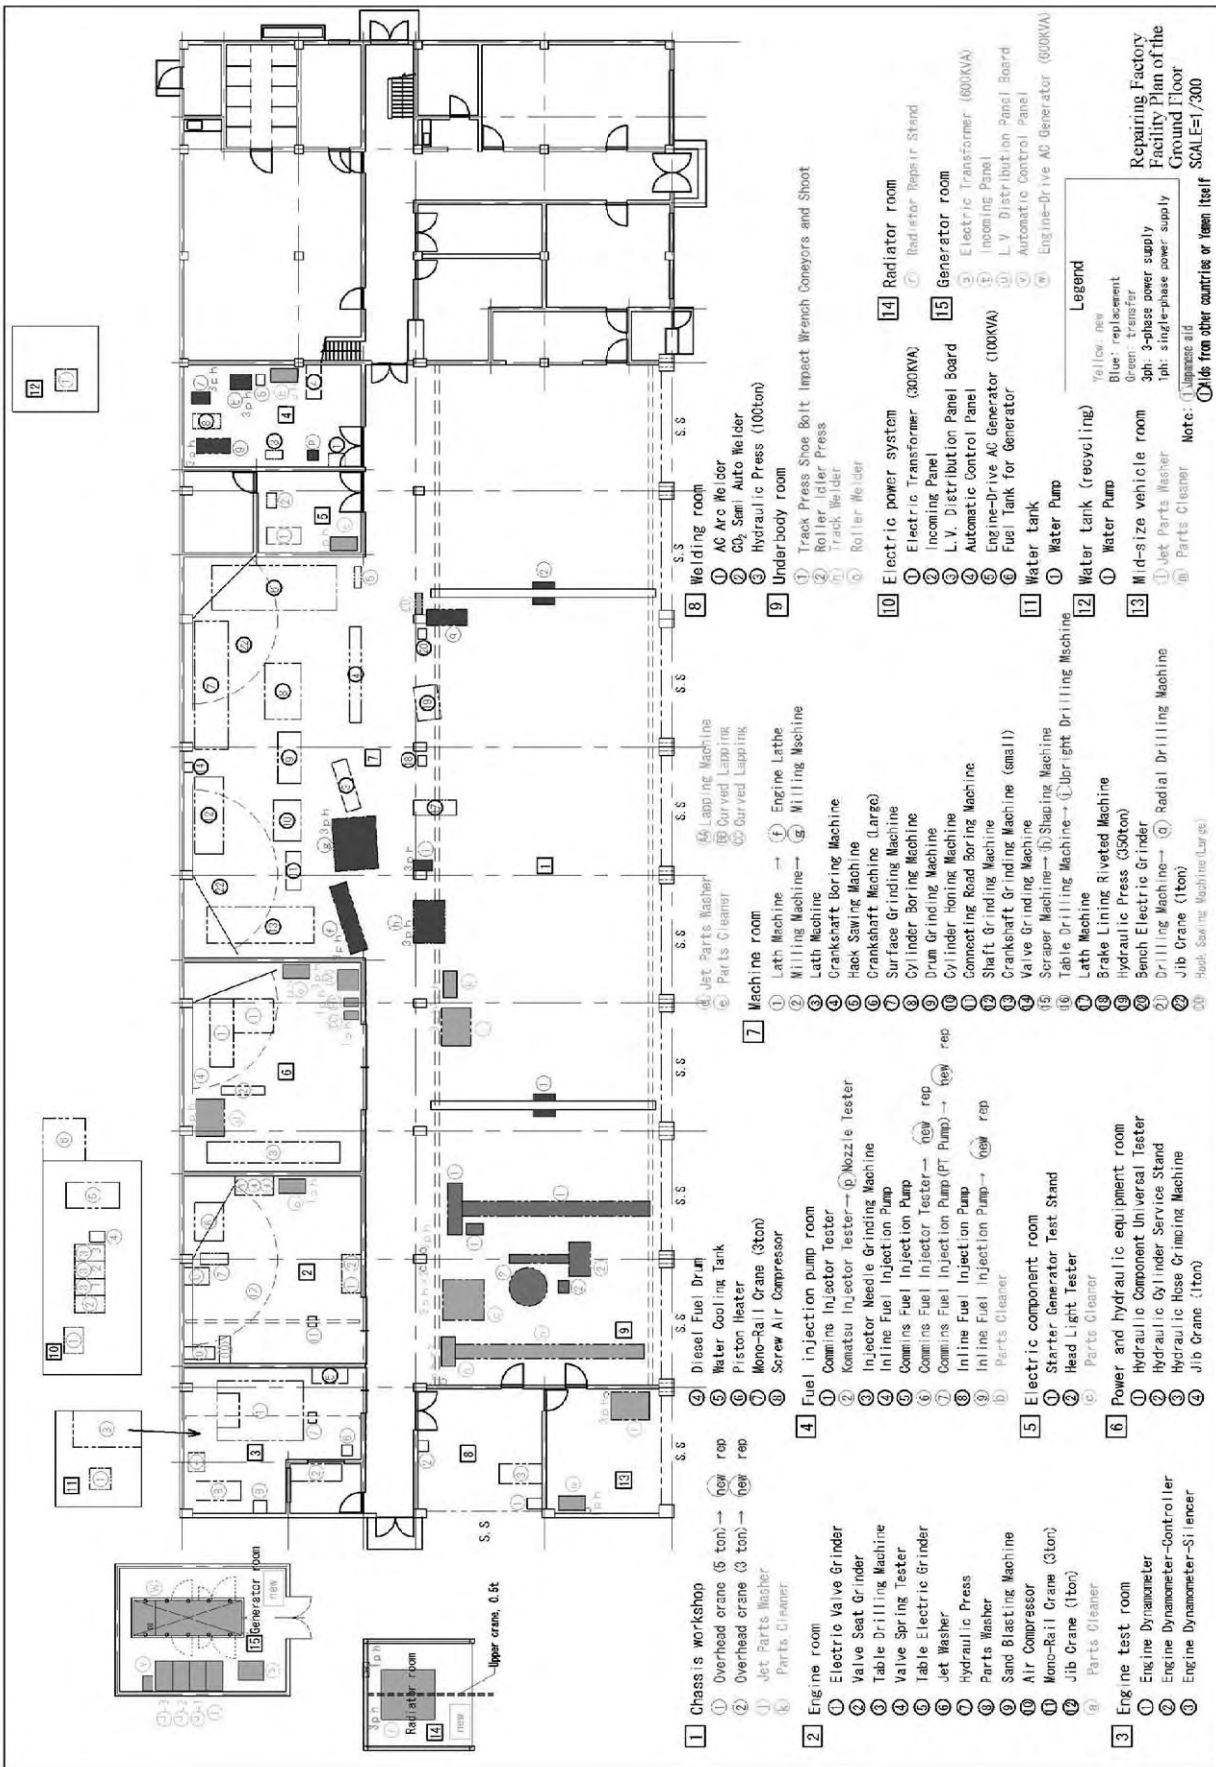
Facility Plan of New Ground Floor of Repairing Factory (including Buildings for Power Generators and Radiators)
